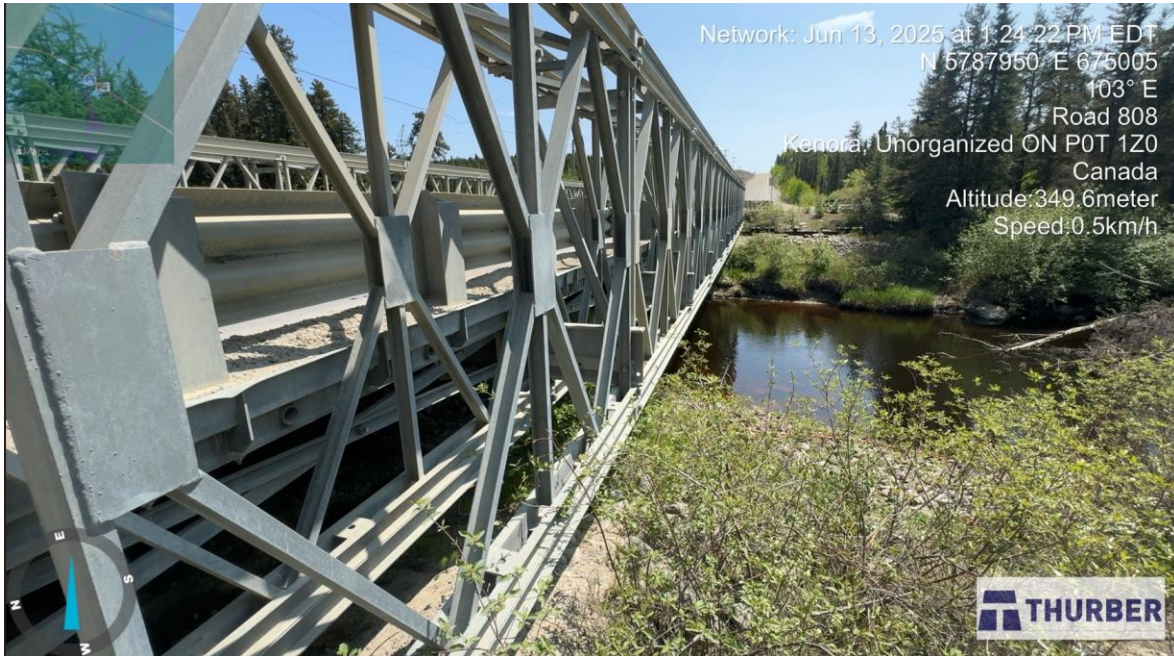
Looking east at the bridge from the embankment fill (June 13, 2025).
